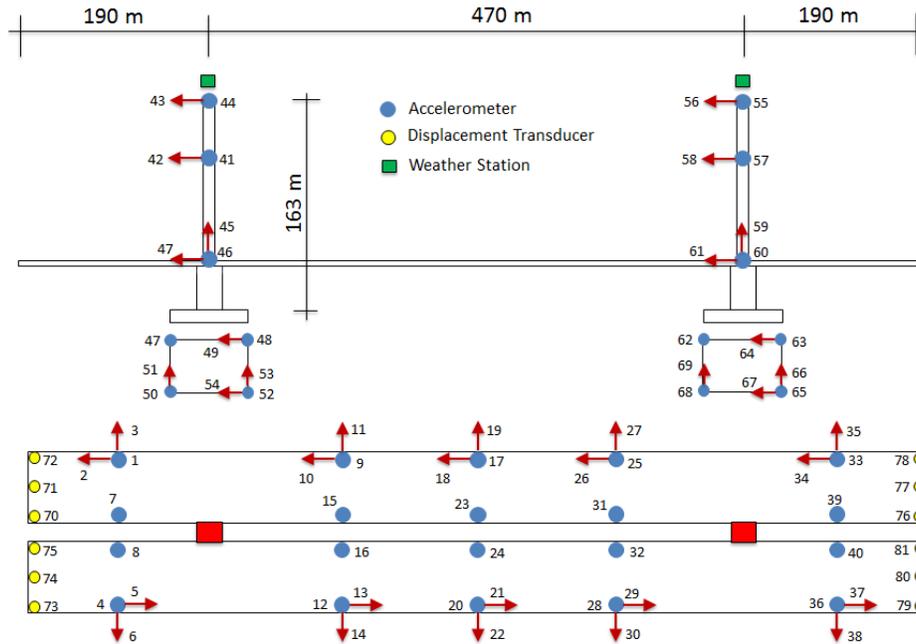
Instrumentation map for Port Mann Bridge (deck, towers and foundation only)
